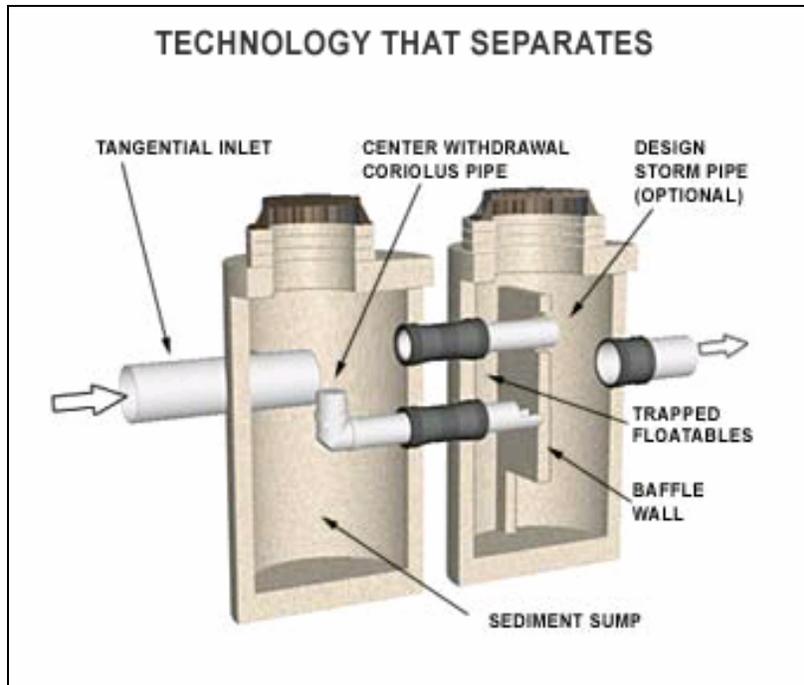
Typical Detail of V2B1™ Stormwater Treatment System
